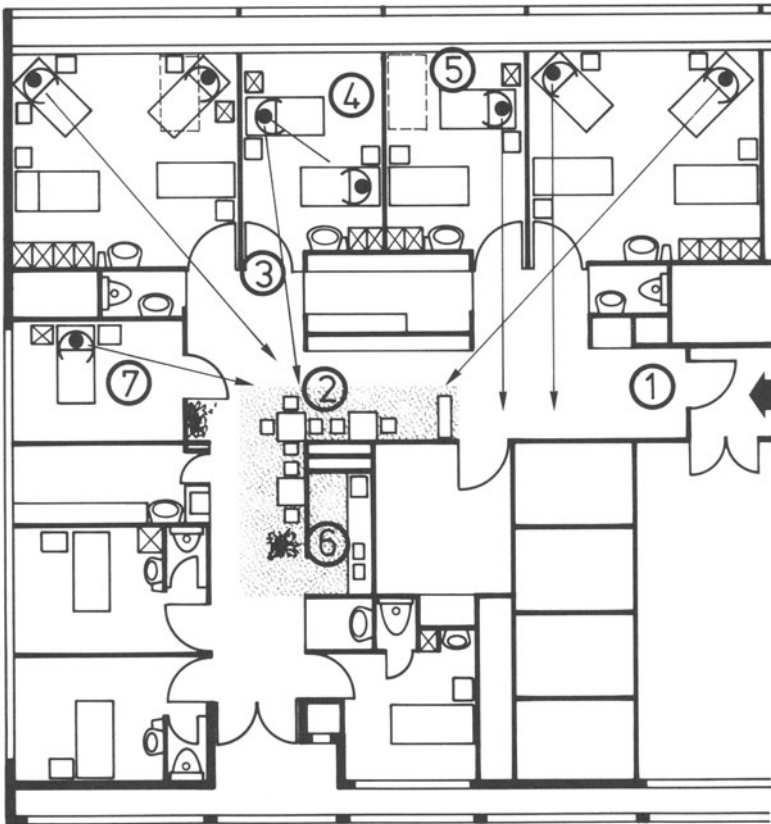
Floorplan care unit A with the s.p./s.p. zone (2) around a small kitchen (6).
